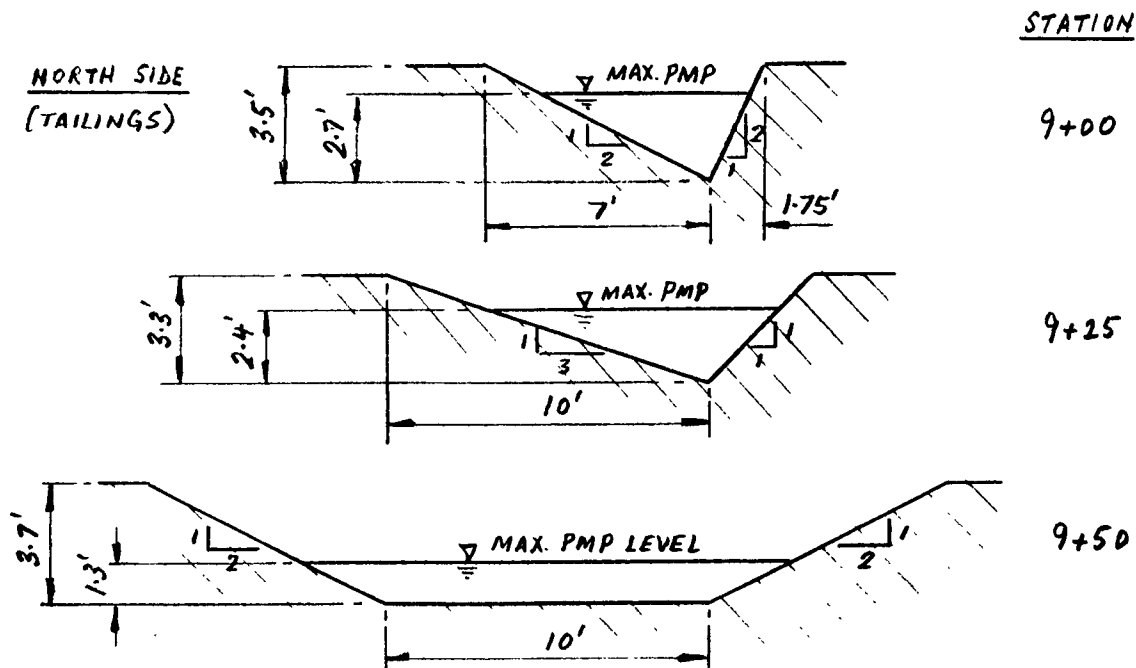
TYPICAL C-1 DIVERSION CROSS SECTIONS
